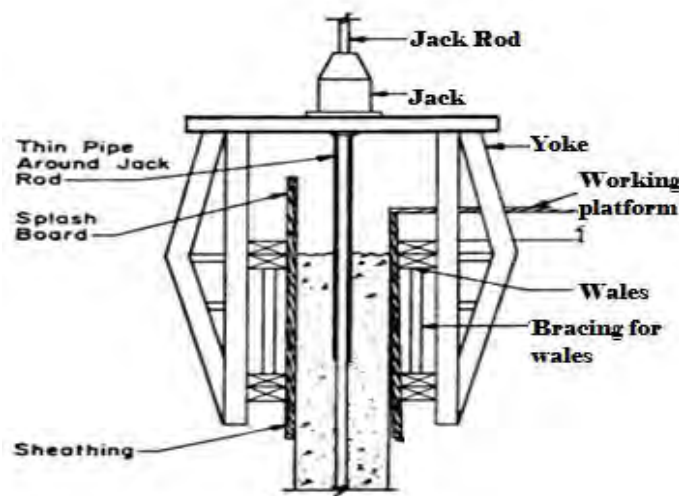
Typical slip formwork (UNITEC New Zealand applied technology, 2009)
